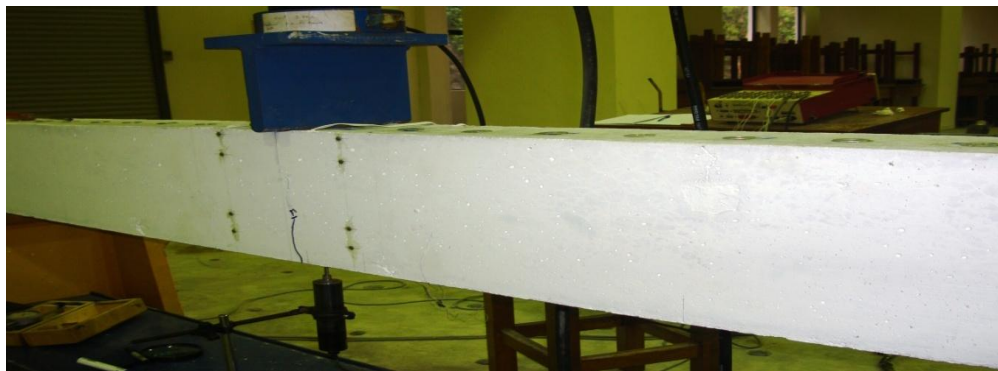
Actual crack pattern at first damage level for beam B121_m
